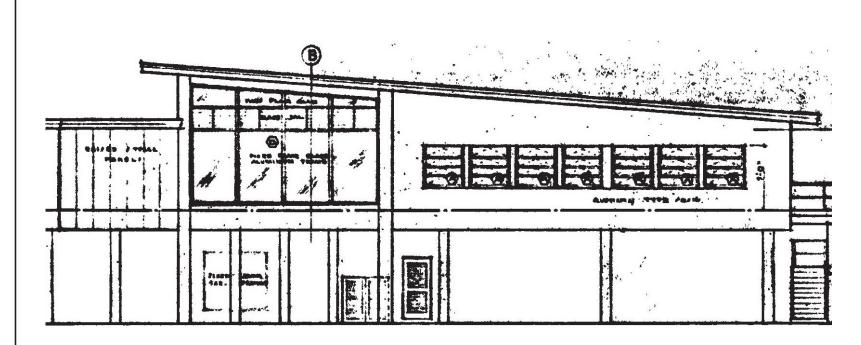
IMAGE W: ORIGINAL BLUEPRINT EAST ELEVATION (KECK. JR. ARCHITECT1956)
